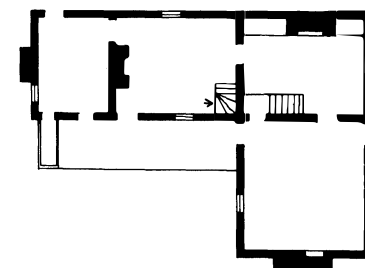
John R. Berry House Plan. Ell ca. 1870.
